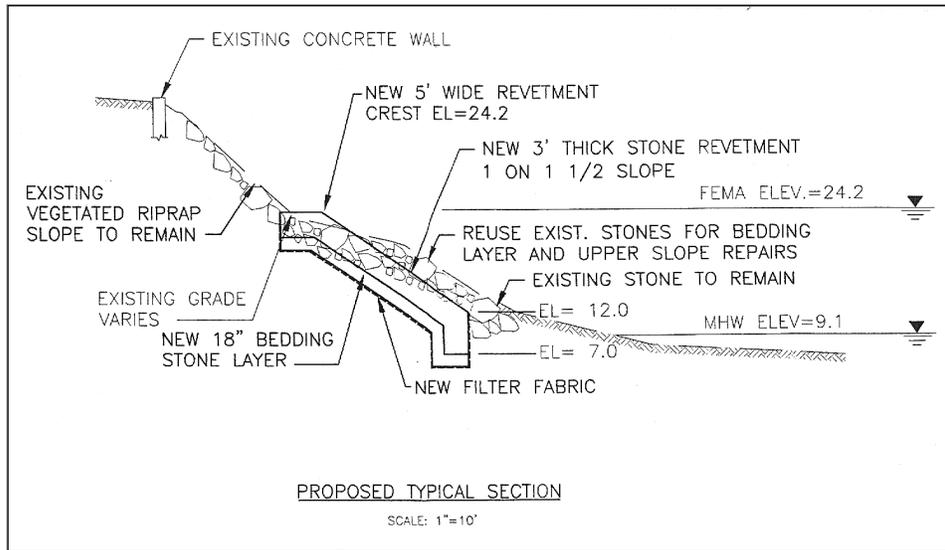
Revised plan with a sloped stone revetment. The sloped revetment is preferable to the applicant's original plan with a concrete seawall (shown in Figures 4.2 and 4.3 on page 4-35), because the sloped rough surface will cause less wave reflection and beach scour.
